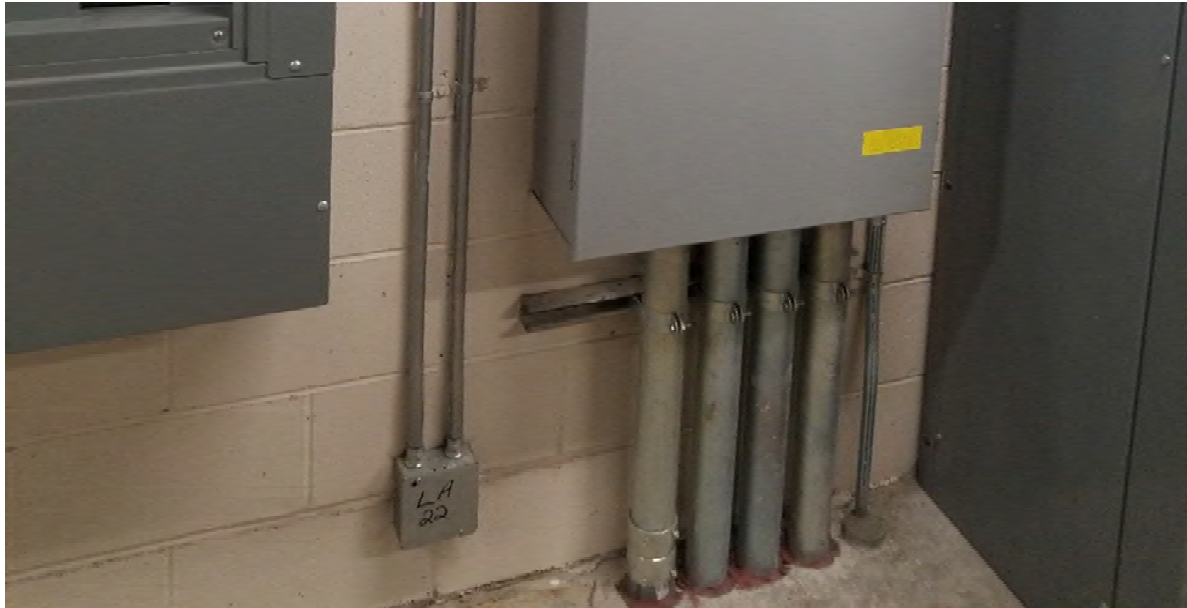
Typical conduit to panel without flexible connections, at the South mechanical penthouse.
